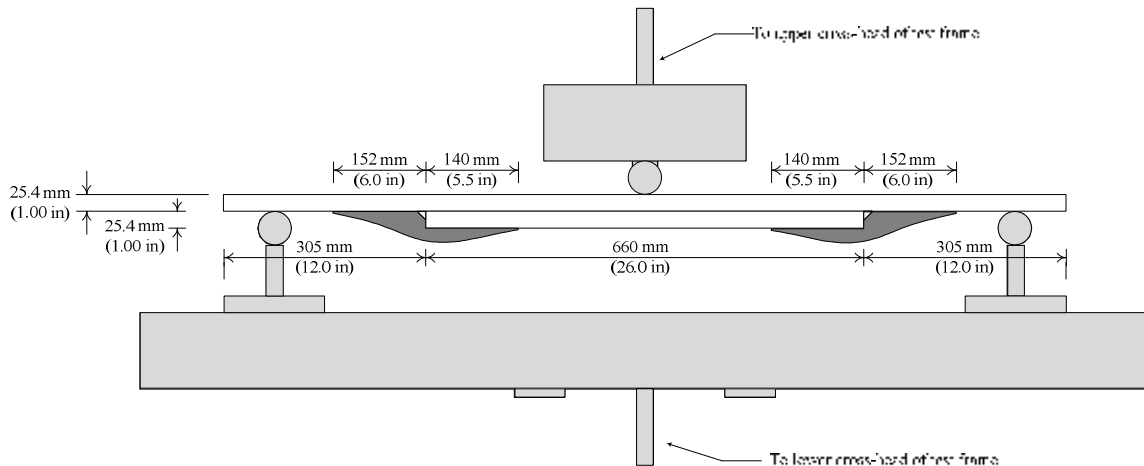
Schematic of Three-Point Bending Fixture with CFRP-Stiffened Specimen
